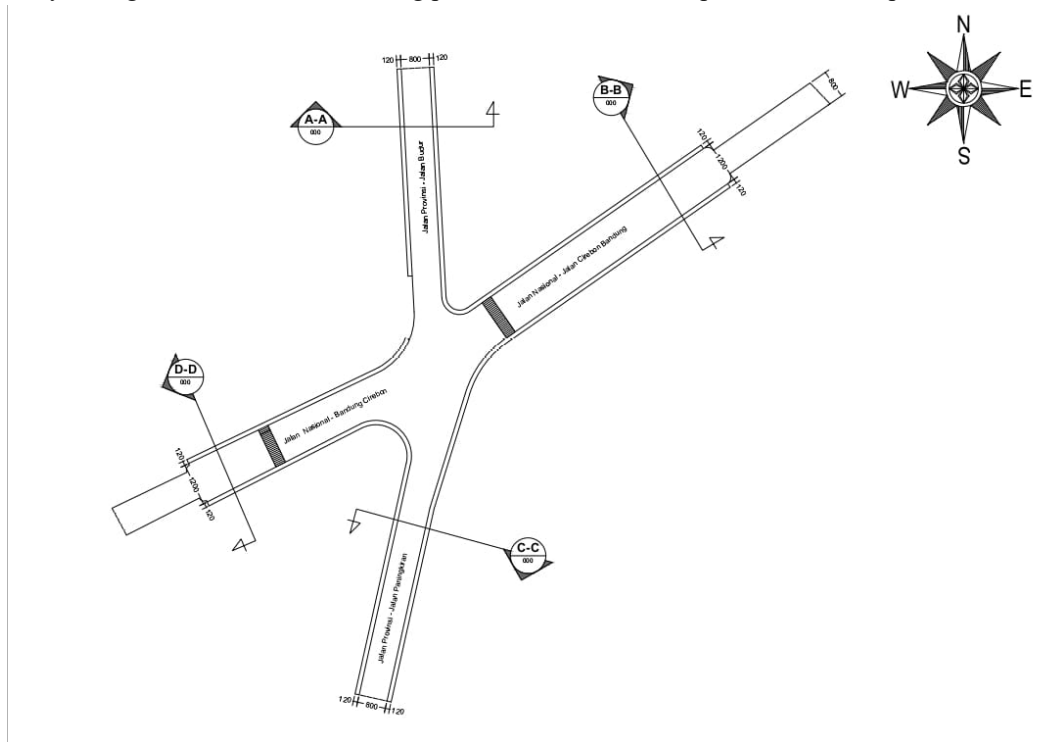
Geometric layout and road orientation at Panjalin Intersection (field drawing, 2025).
